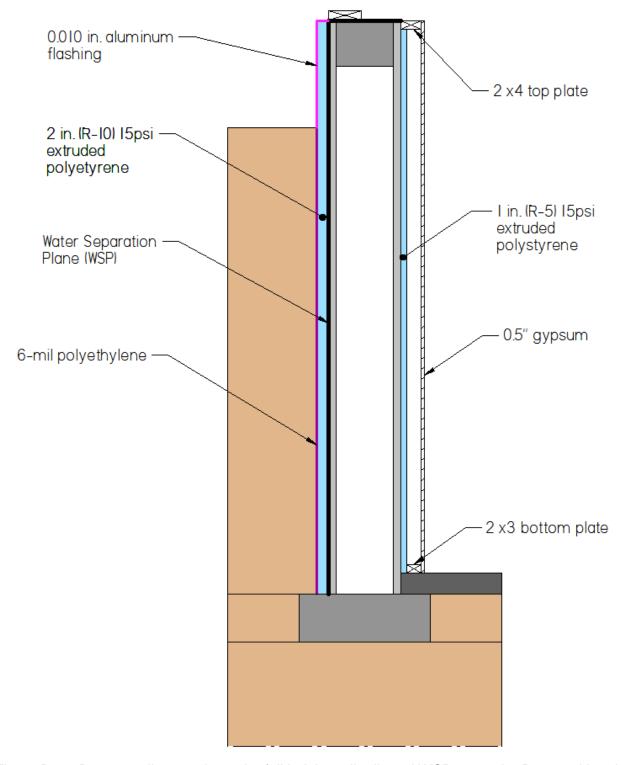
Base + wall top and exterior full height wall adhered WSP + exterior R-10 and interior R-5 extruded polystyrene insulation
